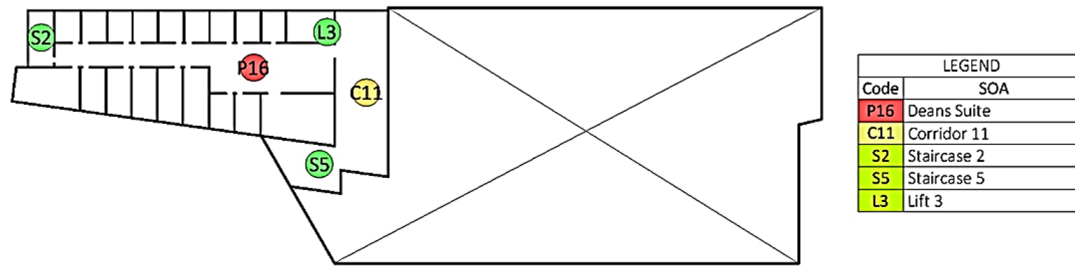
Second floor plan with SOA (redrawn from source: archdaily.com).
